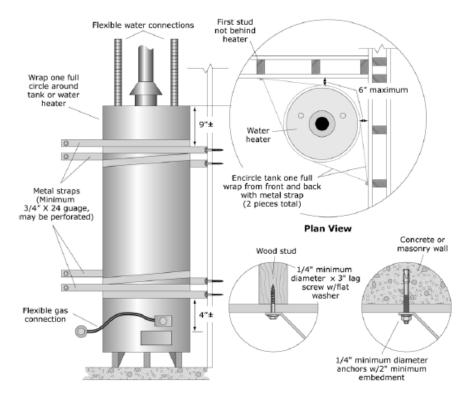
Water Heater – Strapping at Corner Installation. (FEMA E-74, 2012, Reducing the Risks of Nonstructural Earthquake Damage)
